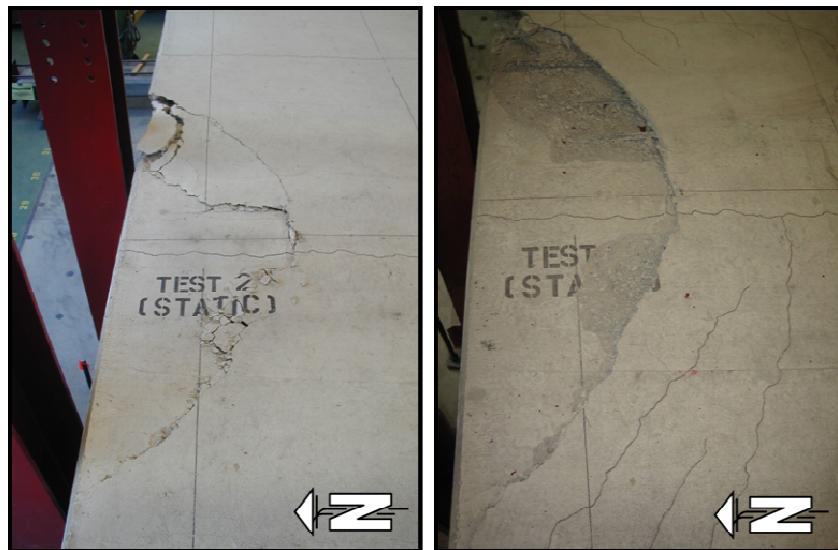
(a): Top view of semi-circular punching type failure for the cantilever section with top transverse CFRP reinforcement subjected to static monotonic loading (Klowak, 2007)
